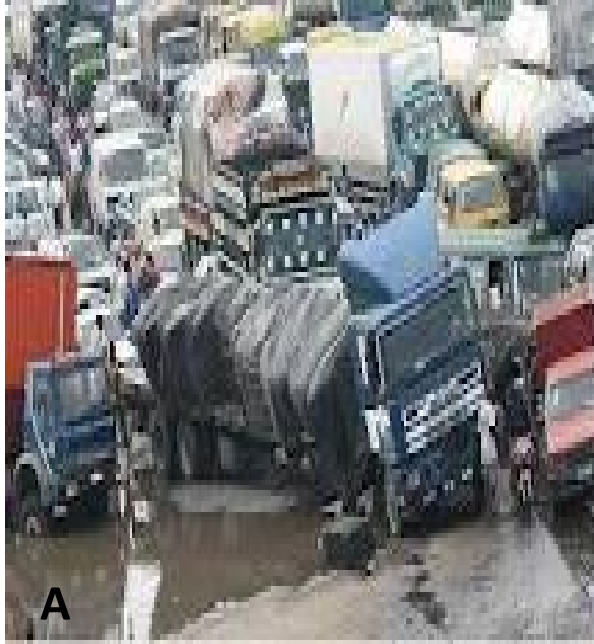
Roads with Poor Drainage Systems along Nigerian highways.
